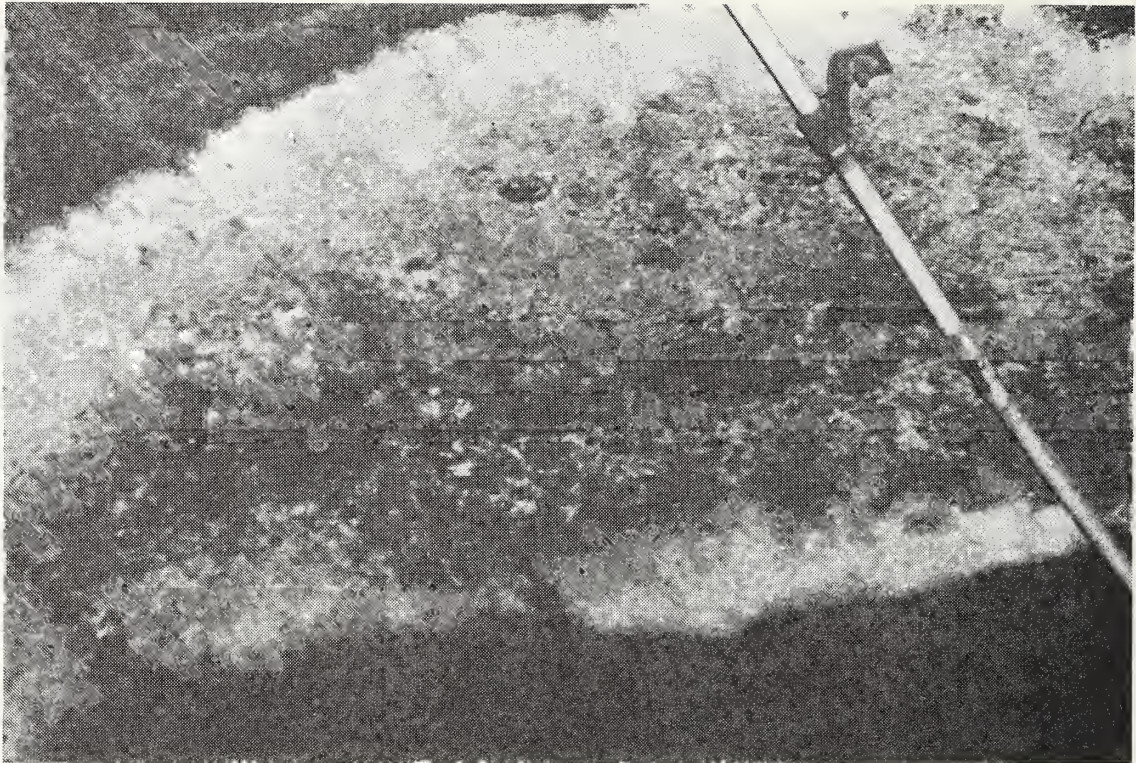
ZONE OF CALCIFICATION AND STALACTITES AROUND A CRACK (GREEN LINE, BOYLSTON-ARLINGTON TUNNEL)
